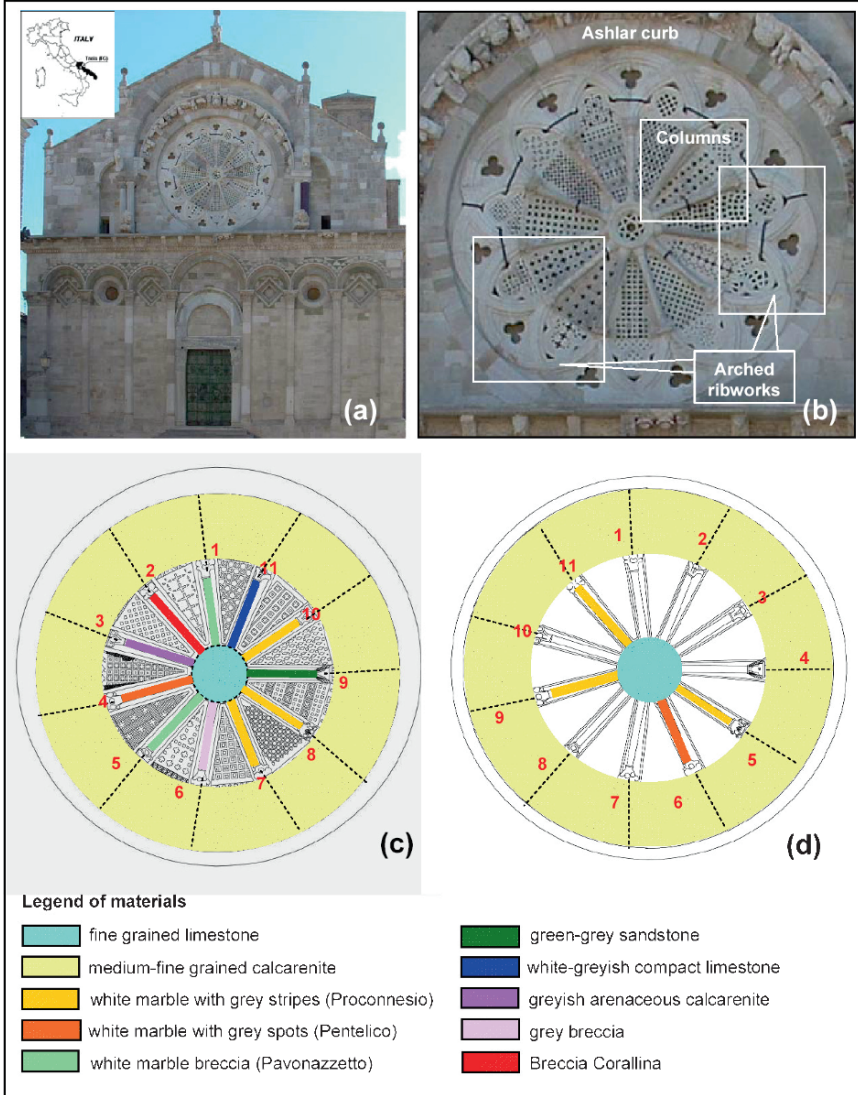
Façade and rose-window of Troia Cathedral
